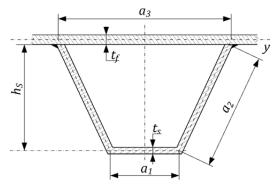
Typical geometric dimensions of the trapezoidal rib
